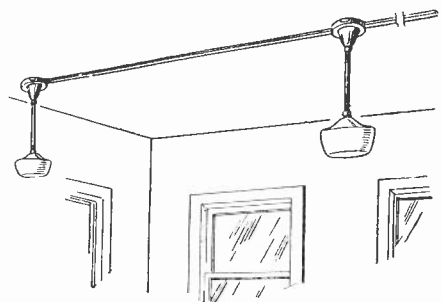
Section of a metal raceway wiring system with two light fixtures attached. Note the neat appearance of this type of wiring for exposed work.
